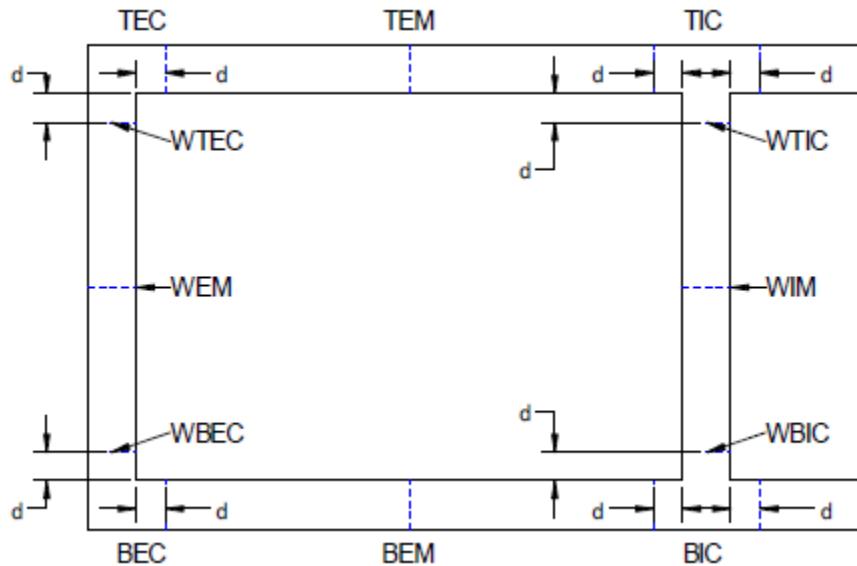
Shear Critical Sections for Box Culverts without Haunches (Culvert Rating Guide, TxDOT)
